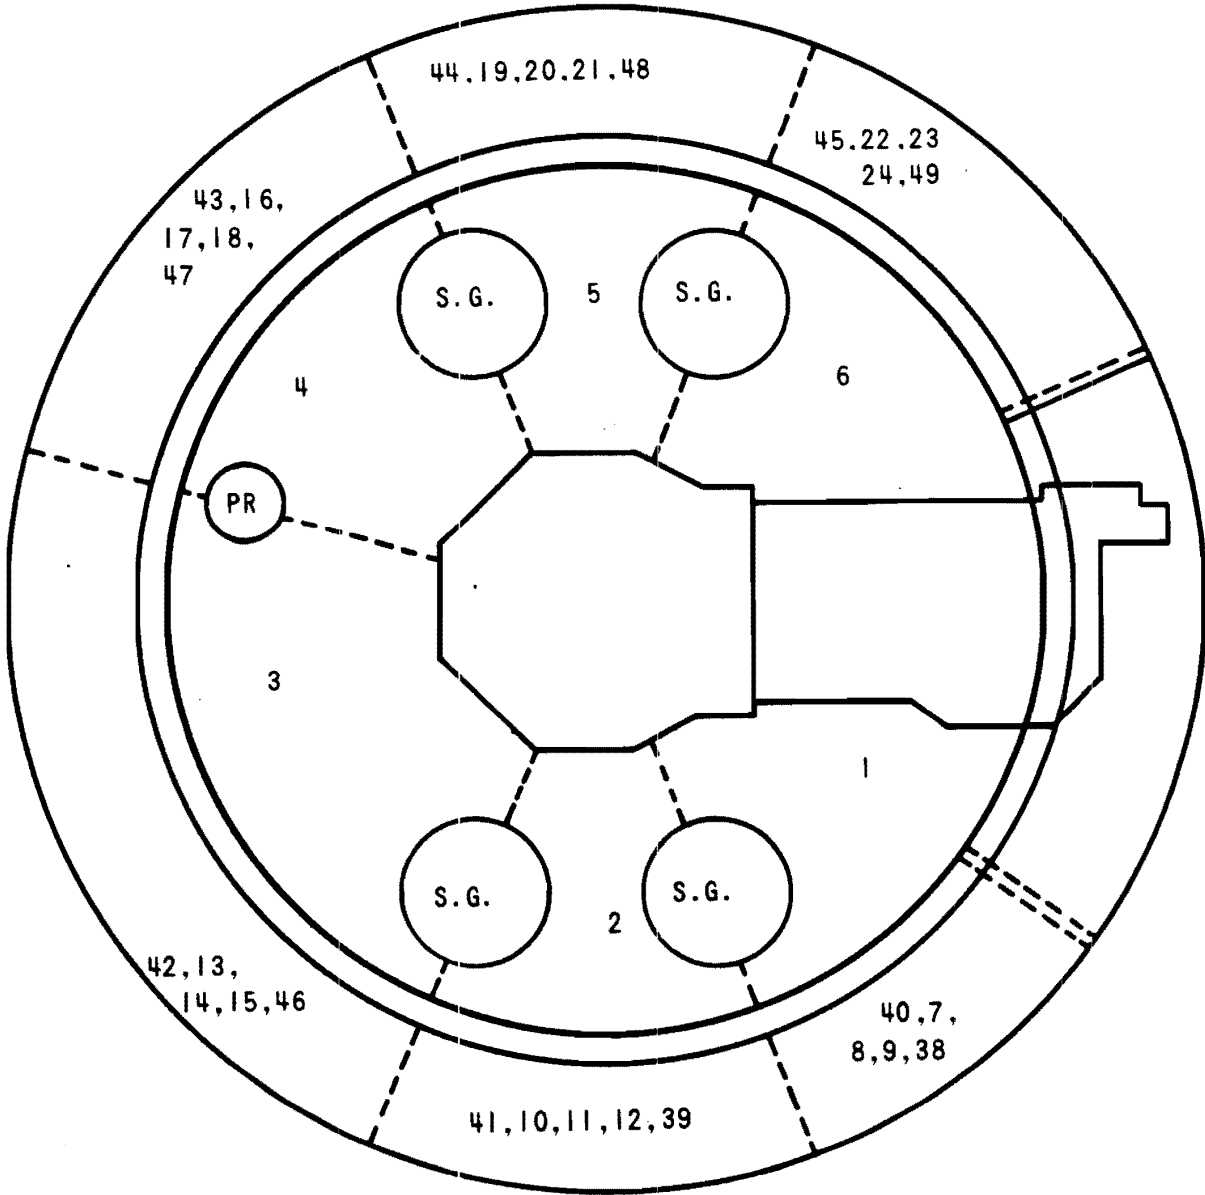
Plan View at Ice Condenser Elevation Ice Condenser Compartments
